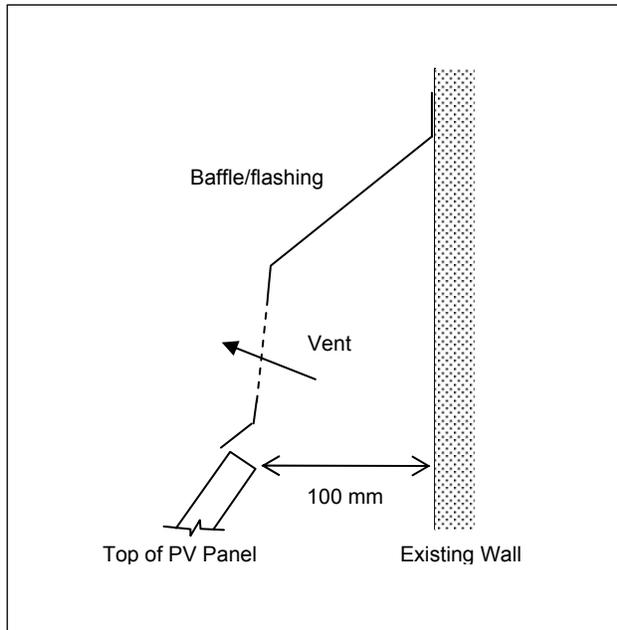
Configuration of the baffle/flashing used above the PV arrays, (side view, not to scale).
